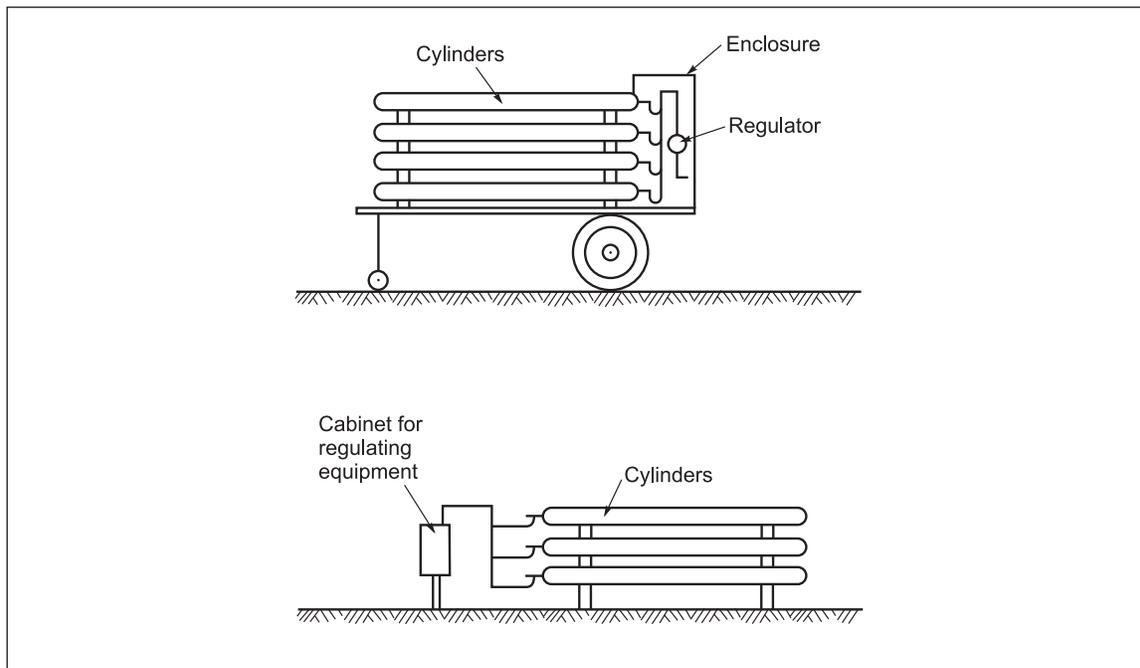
High-pressure oxygen-gas storage. Typical portable installation, above; typical fixed installation, below.
